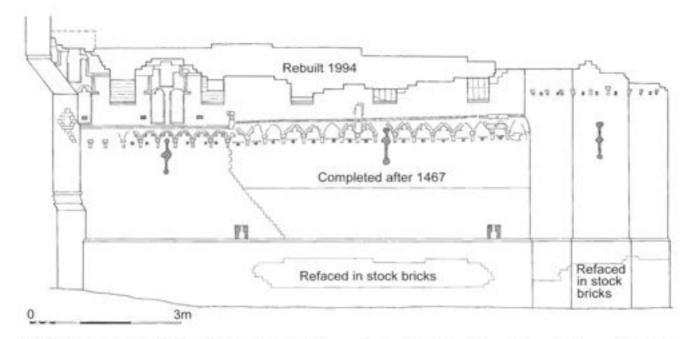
Elevation of the curtain wall to the east of the gatehouse, showing the building joints, evidence for the completion of the work after the death of Thomas Colt in 1467.
